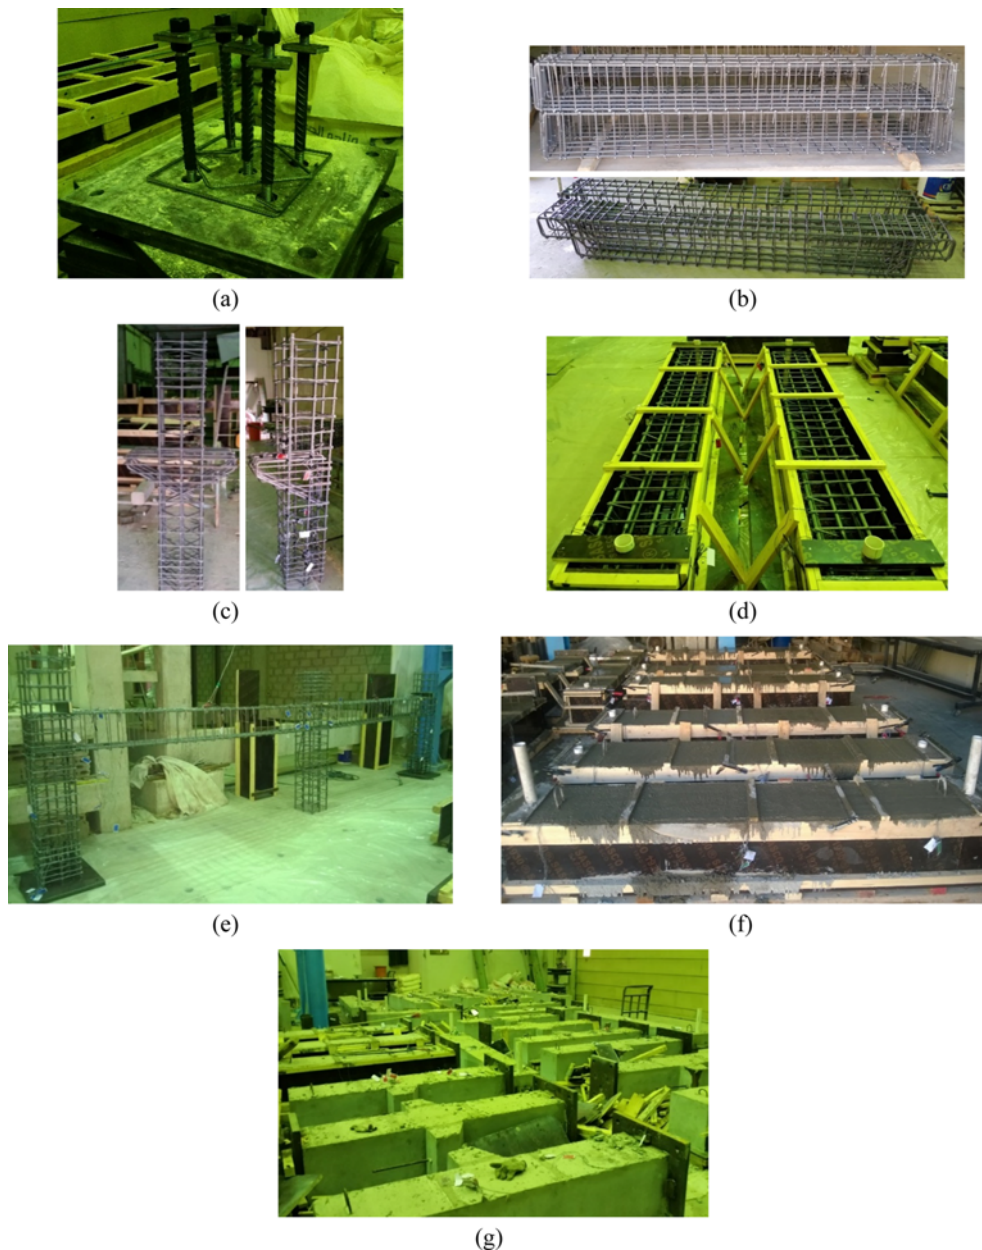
Preparation of Test Specimens: (a) Base Plate with Anchor Rods, (b) Reinforcement Cage for Beams of Precast Specimens, (c) Reinforcement Cage for Columns of Precast Specimens, (d) Reinforcement Cages Placed in Wooden Formwork, (e) Reinforcement Cage for Monolithic Specimen MC-SMF, (f) Casting of Precast Elements, (g) Individual Precast Elements after Demolding
